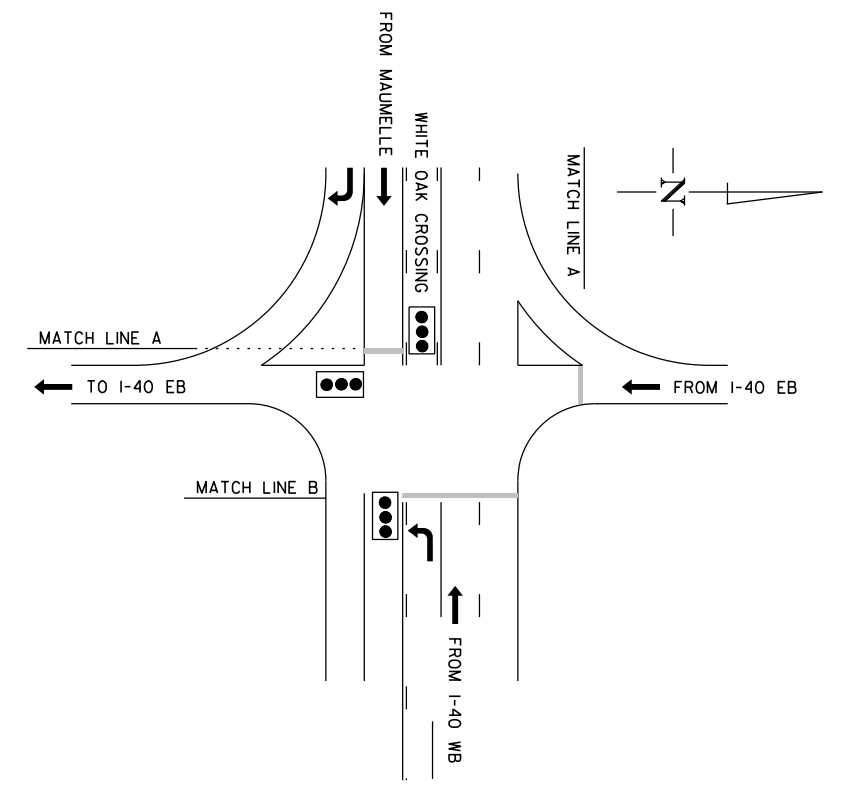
DETAIL OF PORTABLE TRAFFIC SIGNAL SYSTEM FROM I-40 WB TO WHITE OAK CROSSING
